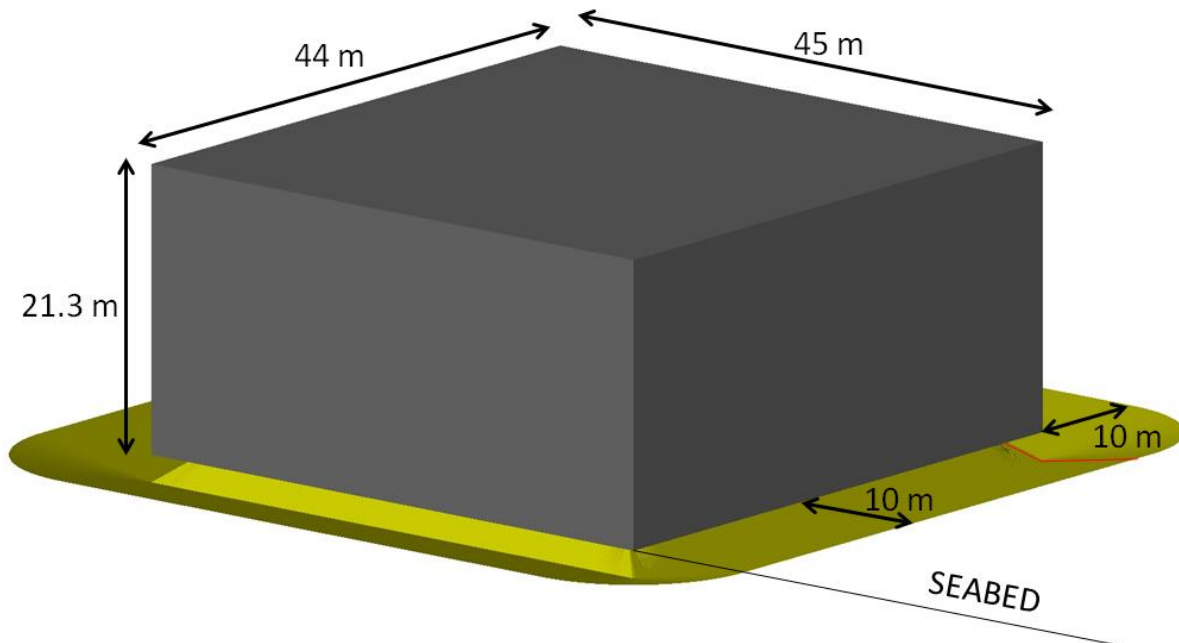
3D Rendering SW Anchor Scour Vertical Wall
